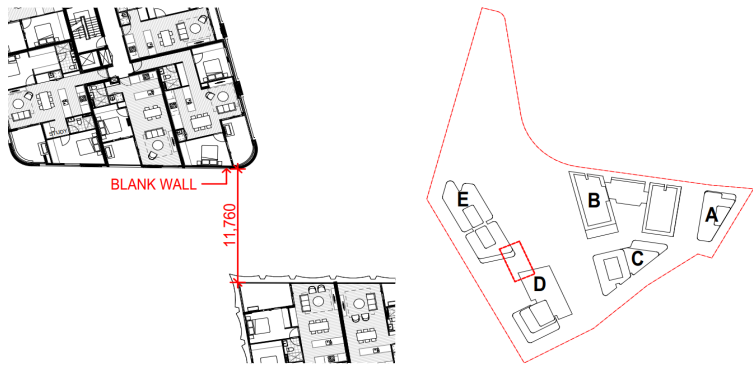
F1.1 Building D-E separation (storeys 1-2) & Key Plan
